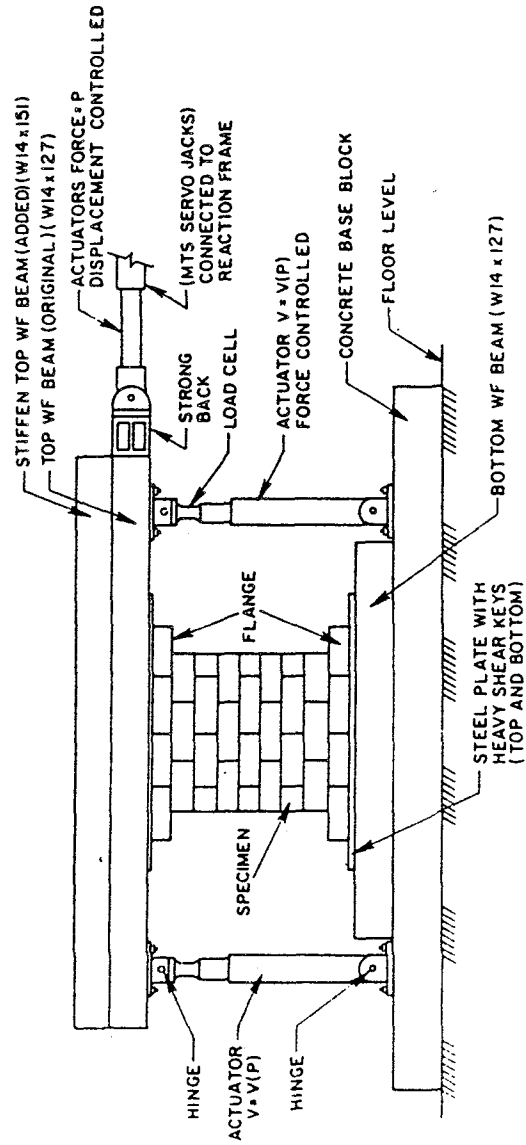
MODIFIED SINGLE PIER TEST SETUP
